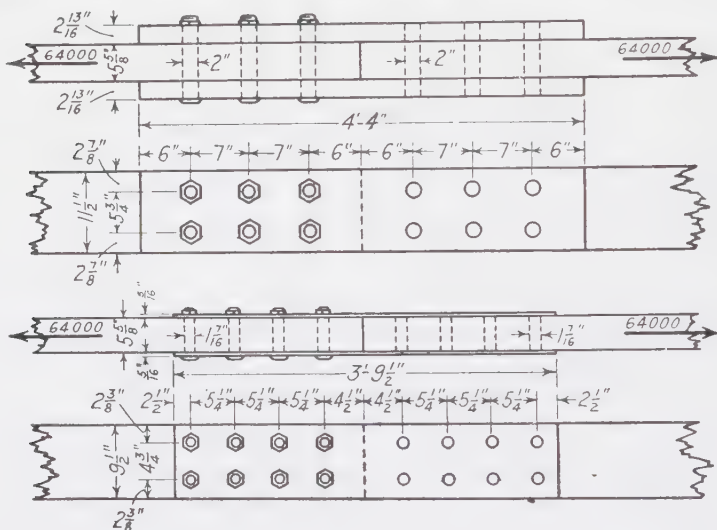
Working Drawing of Plain Fish-plate Joint.
